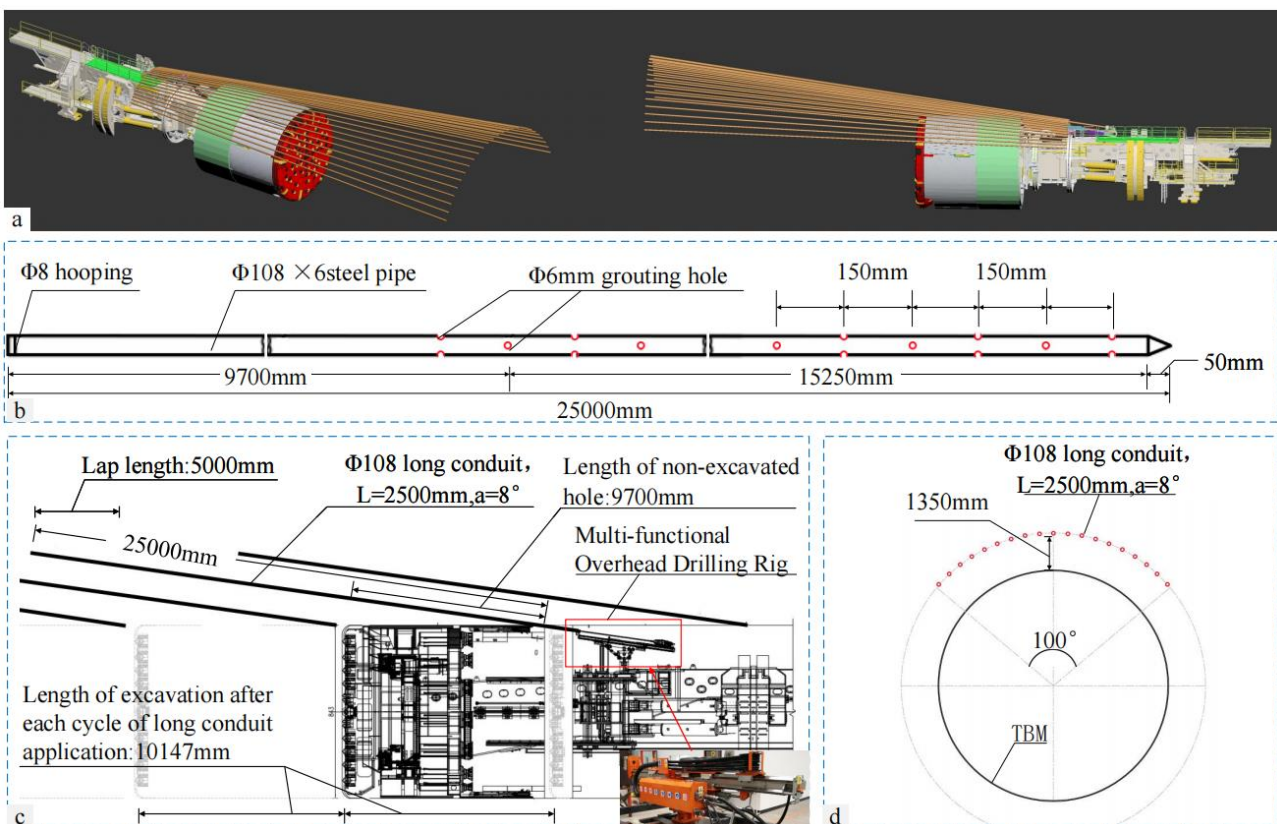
(a) Schematic diagram of over-advance pipe shed reinforcement; (b) Steel pipe sample drawing; (c) Section drawing of pipe shed reinforcement; (d) Sectional view of the upper 100° range of the pipe shed reinforcement cutter plate
